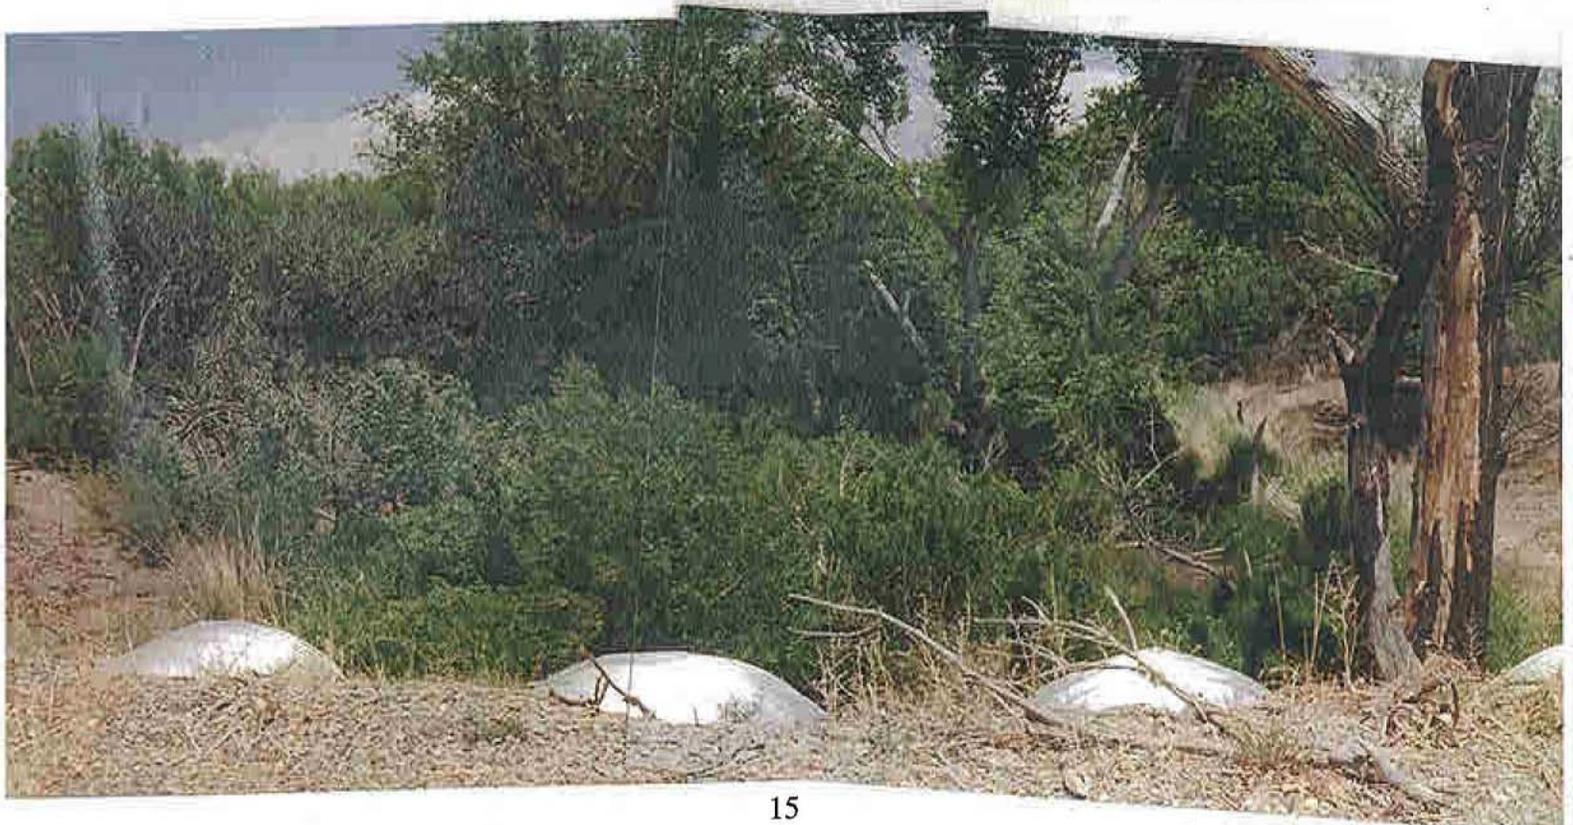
Upstream side of the railroad crossing. Twelve 9-foot CMP's.
